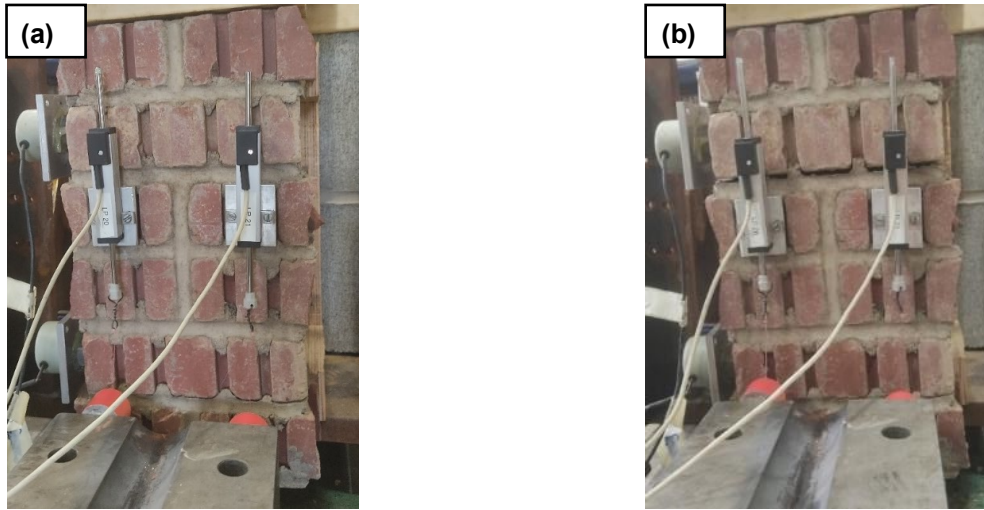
External face of veneer (VC tie) (45 mm embedment): a) early stage of test, and b) cracks on the specimen after the test.
